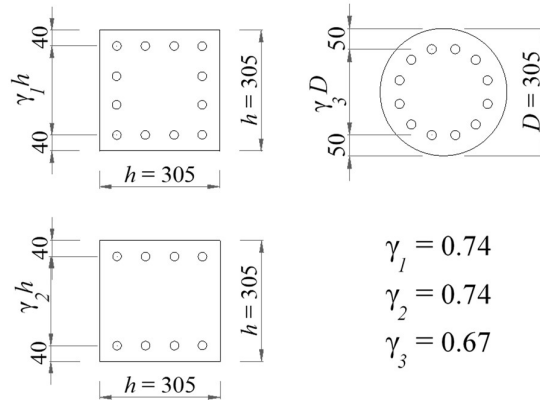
Typical cross-sections of GFRP-RC columns considered in the parametric study.
